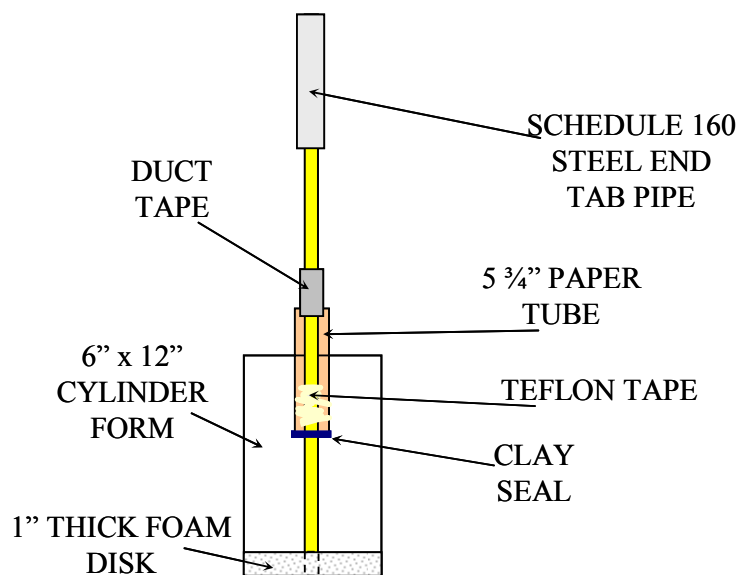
Bond Specimen Detail for 10-mm DHFRP Bars.
